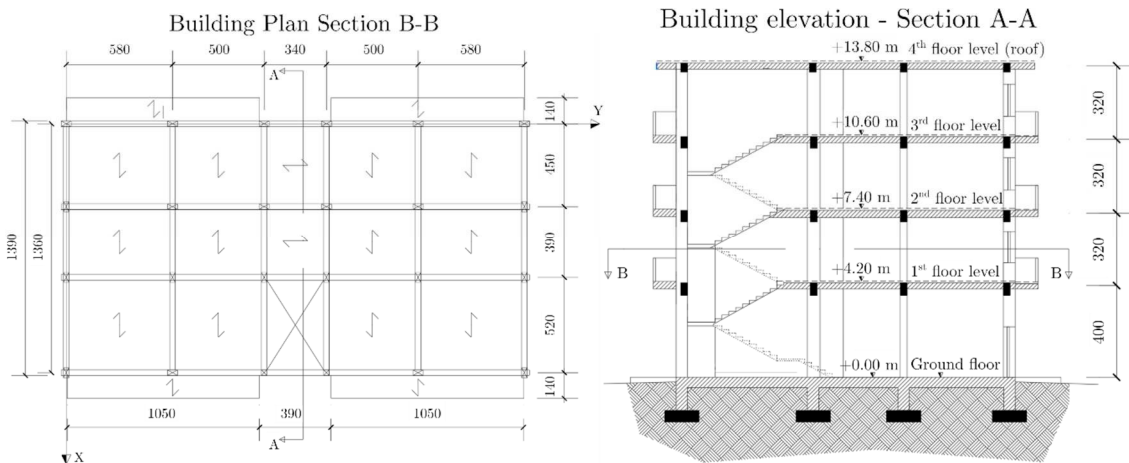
Shear-type existing RC frame case study: plan view and lateral sectional view.
